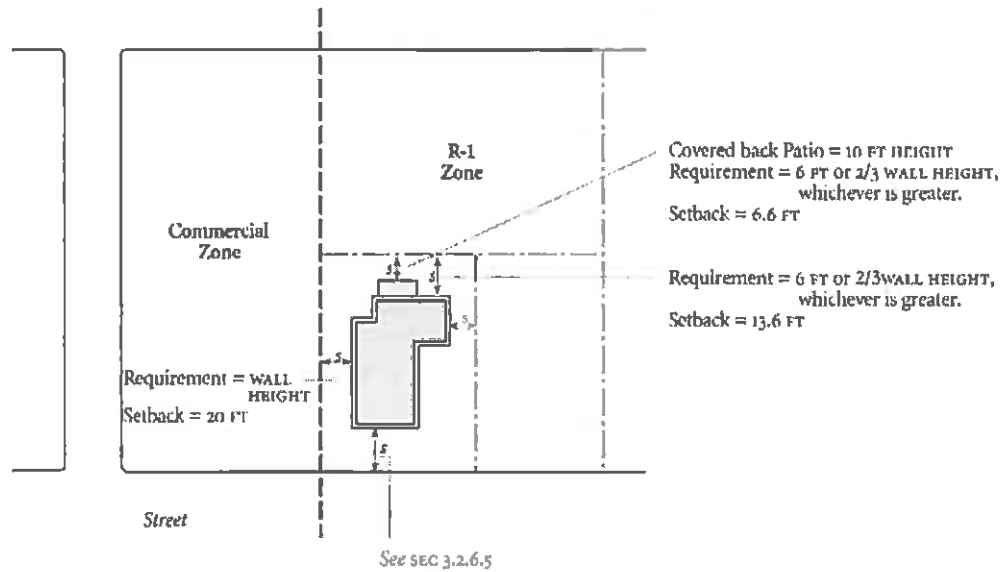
B-3: Example of Perimeter Yard (Wall Height = 20')
